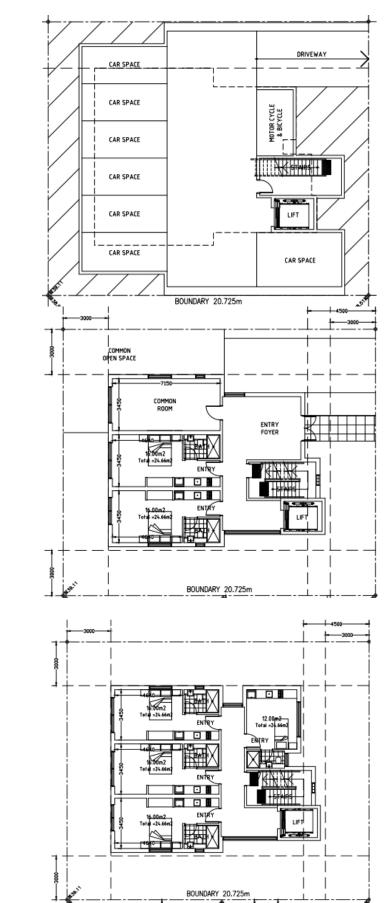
Basement floor plan, Ground Floor plan, and Level 1-3 floor plan of schematic development on 66A Caledonian Street
